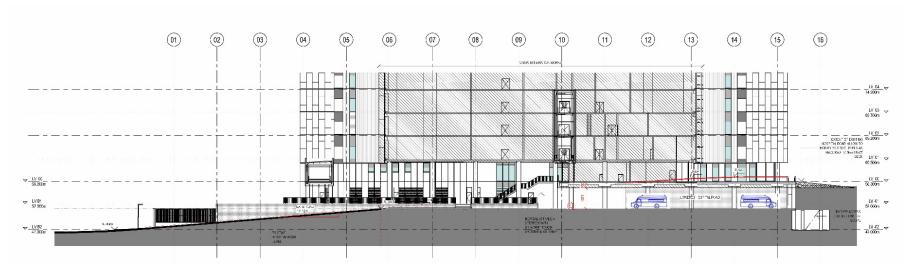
Proposed section along Hospital Road looking west. Plan by BVN Architecture 20.12.2018, provided by Advisian
